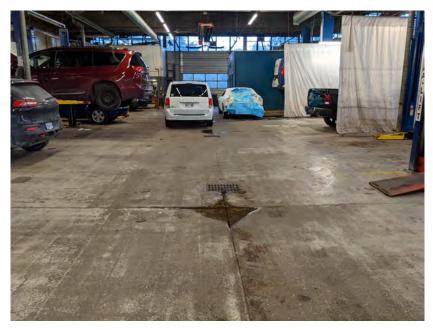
Garage driveway, drains located in the center of the garage along the length of the floor. Looking north
